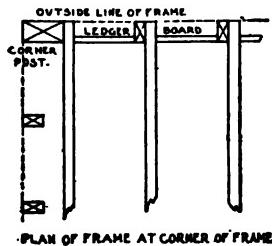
Ledger-Board or False Girt. Balloon-Frame Construction.
